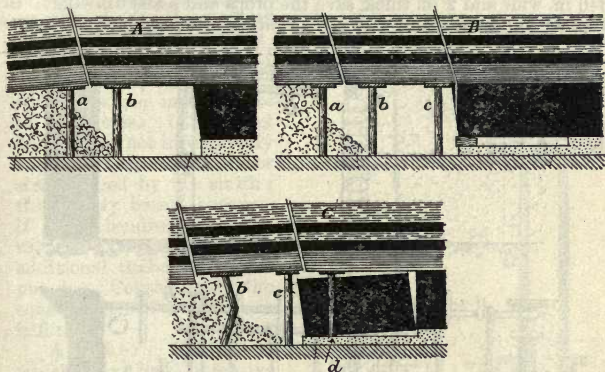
TIMBERING AT EMLY-MOOR COLLIERY.
